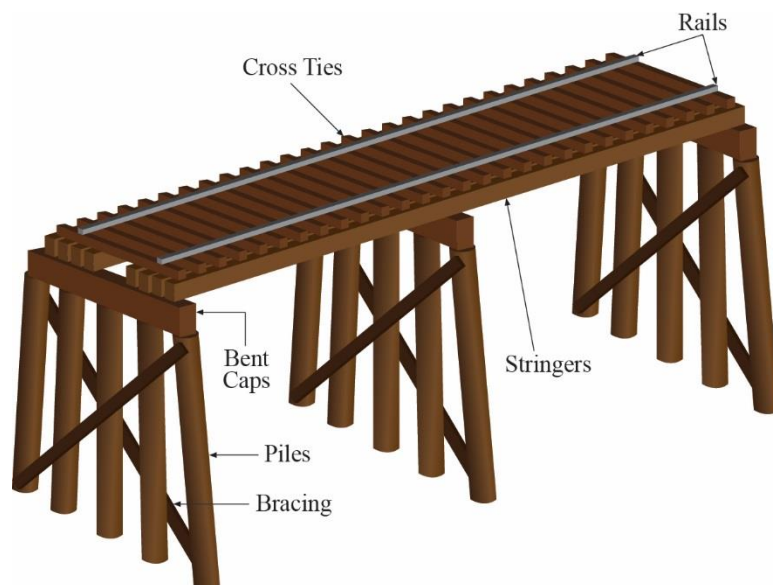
Configuration of a typical timber railroad bridge (Rachal 2015)
